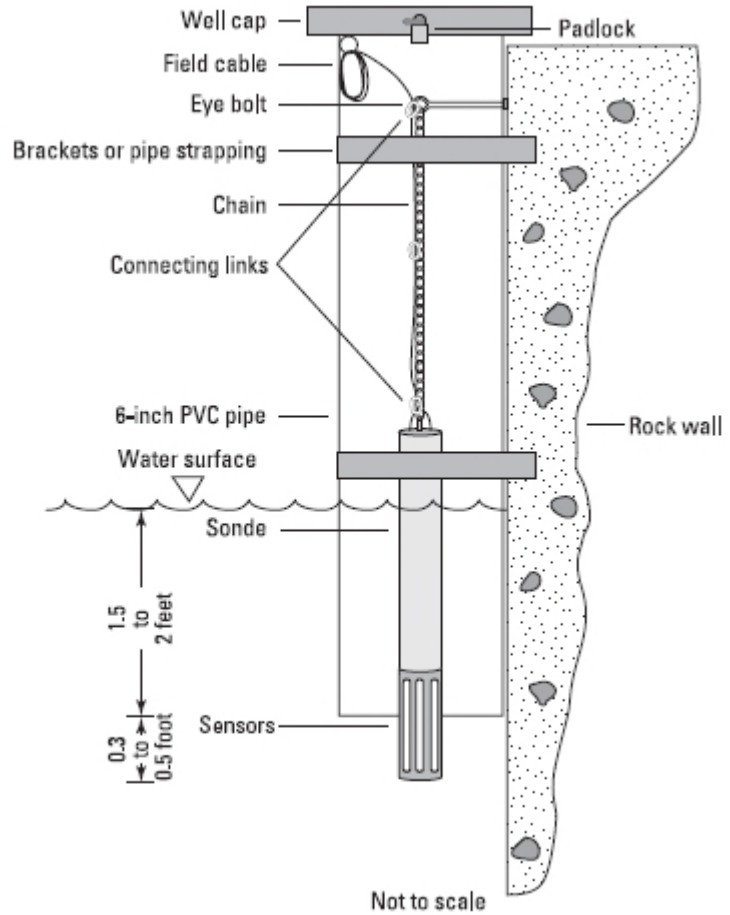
Water Quality Instrument in a wall-mounted PVC pipe well
